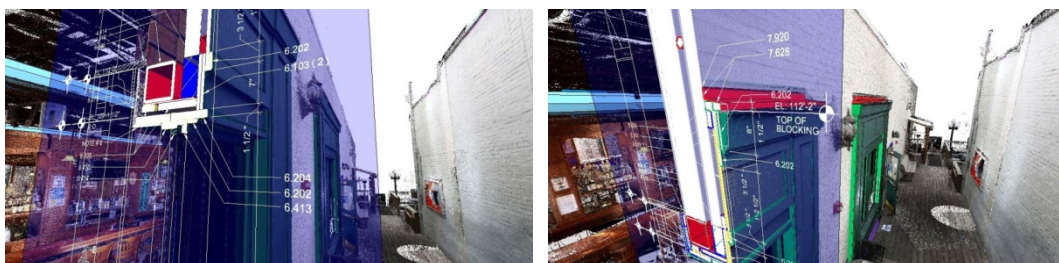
Point cloud augmented with 2D section drawing and some clipped 3D elements.
